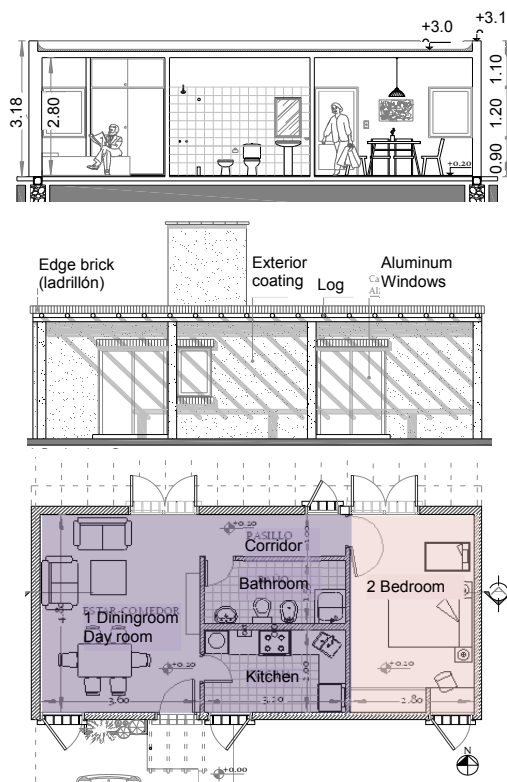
Plant, North view and house plan, 2 hygrothermal zones (1 day room, 2 bedroom)
